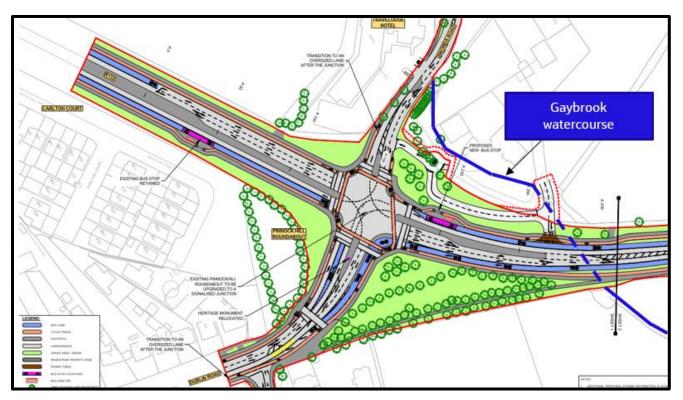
Proposed works at Pinnock Hill Roundabout and R132 (around Ch. A00 +250)
